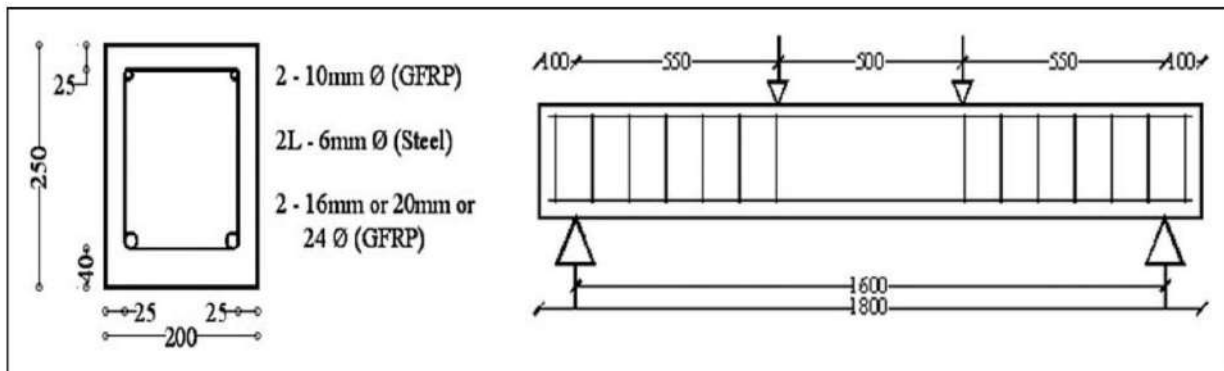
Cross-section detail and test setup of beam (Kalpana and Subramanian, 2011)
